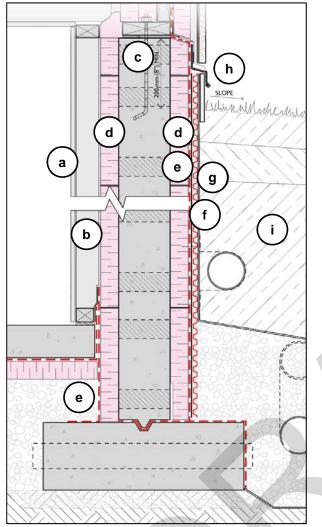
Foundation Wall Formed with Insulating Concrete Forms (ICF).
